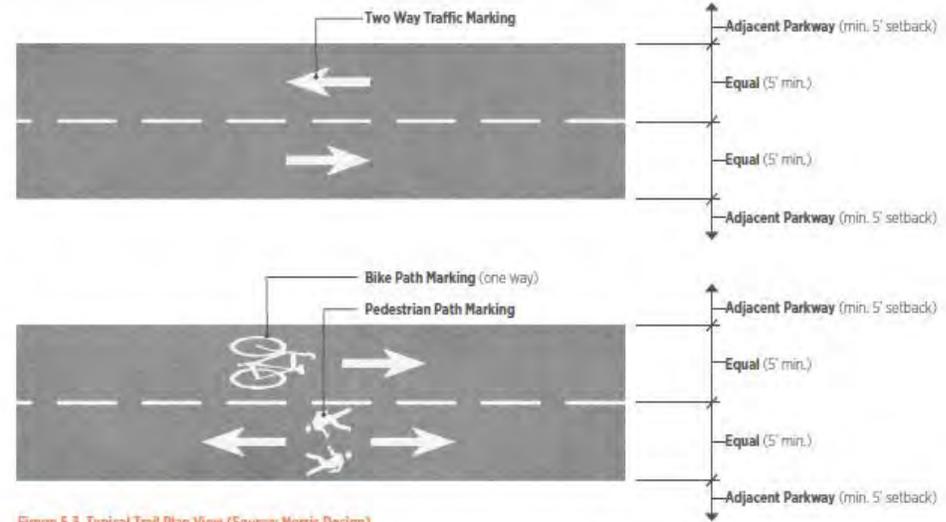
, Typical Trail Plan View (Source: Norris Design)
